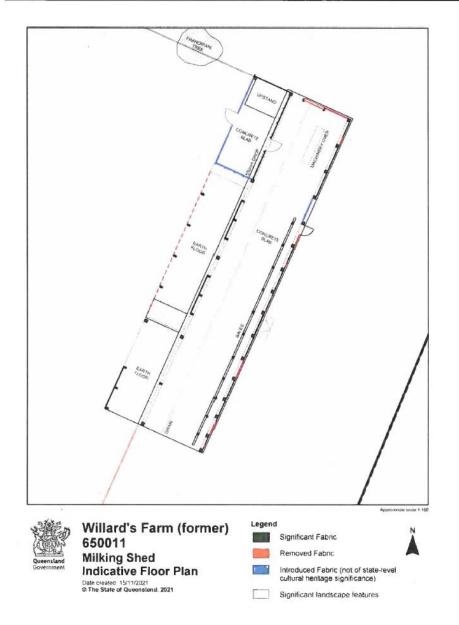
Indicative floor plan – Milking Shed (Queensland Government, 2021)
